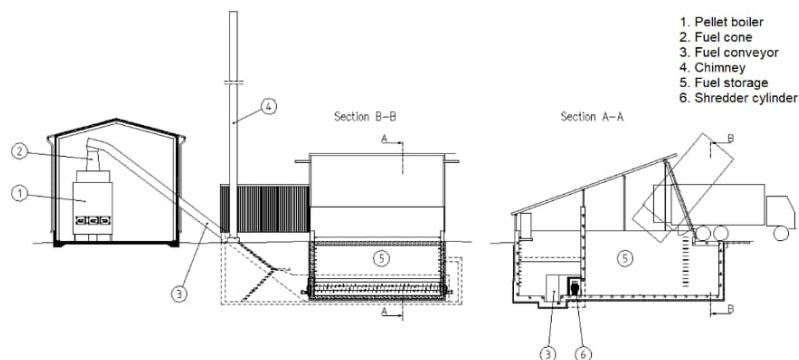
Illustrative cross sectional diagram of a 0.5 – 10 MW pellet plant. Photo by courtesy Laatikattila Oy.
